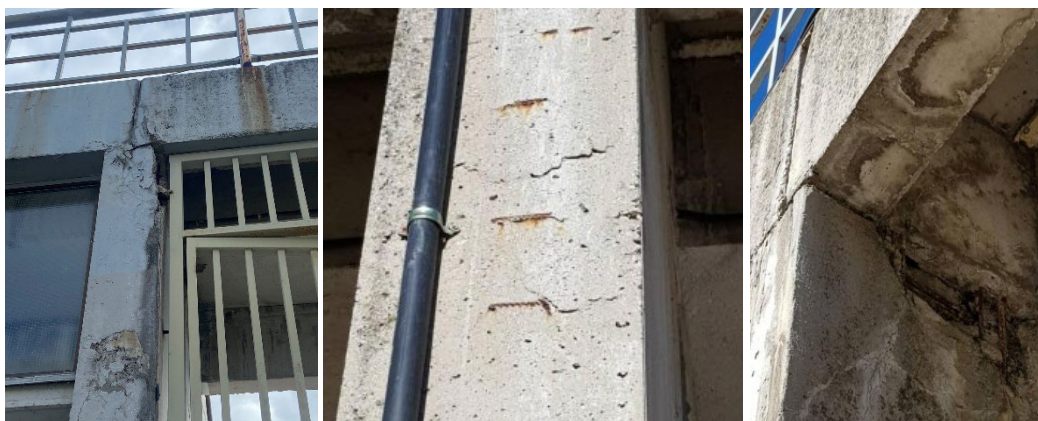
Examples of damages on construction (from left: cracks on column, corrosion, concrete separation)
